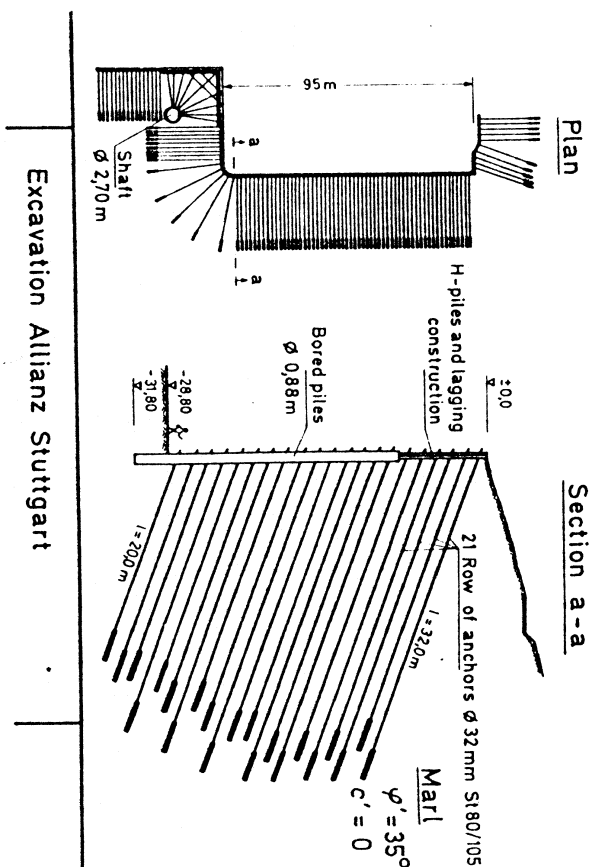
Anchor arrangement around re-entrant corner, Stuttgart
